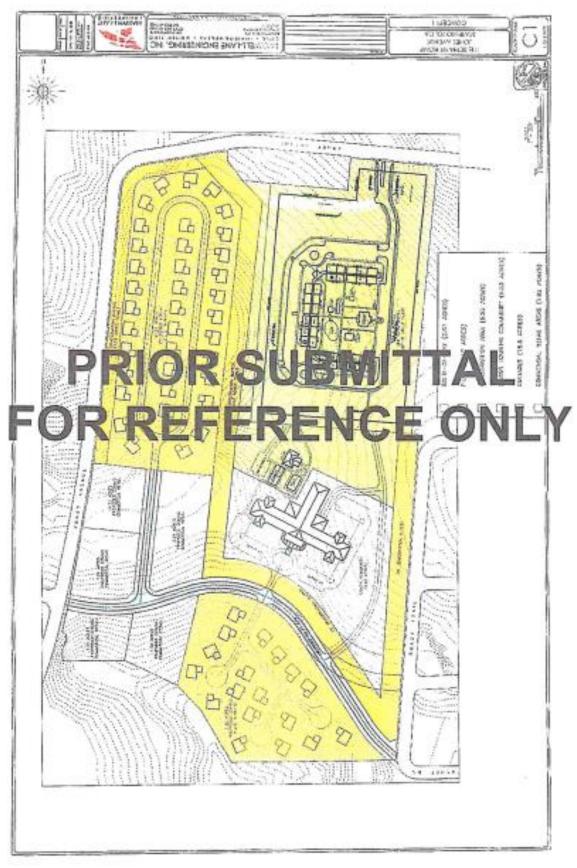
Approved Site Plan & Current 2010 Approved Site Plan (continued)
